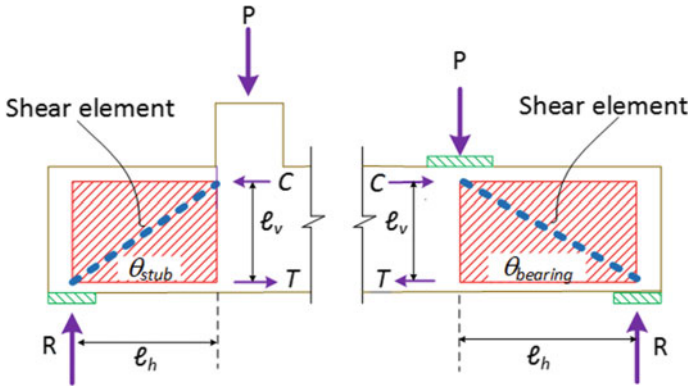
Illustration of shear element for specimens with column stub and bearing plate
